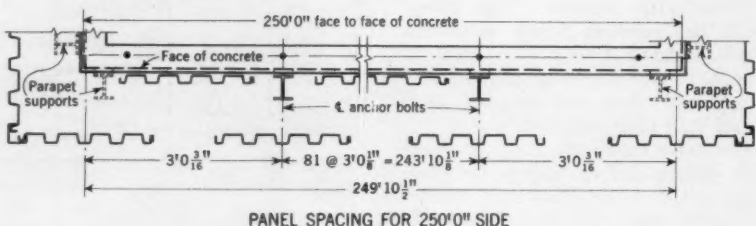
Garage "skin" consists of overlapping aluminum panels baffled to allow free circulation of air while excluding the elements and direct sunlight.
